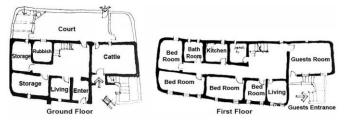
Ground and first floor plan for a sample house in Siwa b. Ceilings:
